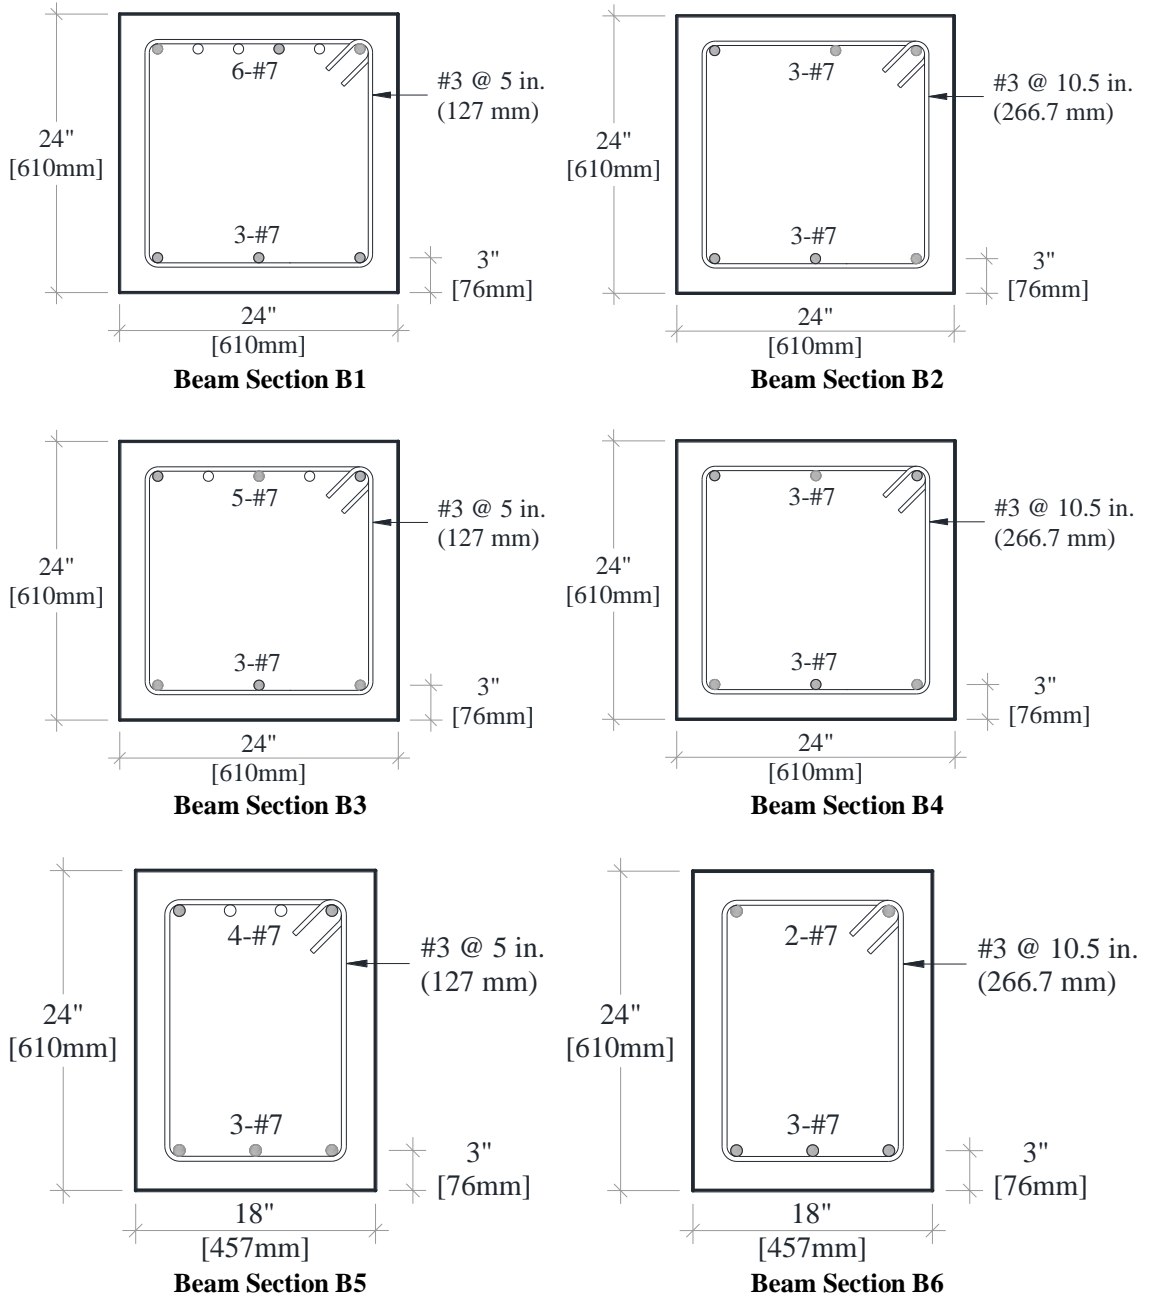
Section Details for Six-Story Intermediate Moment-Resisting Frame
